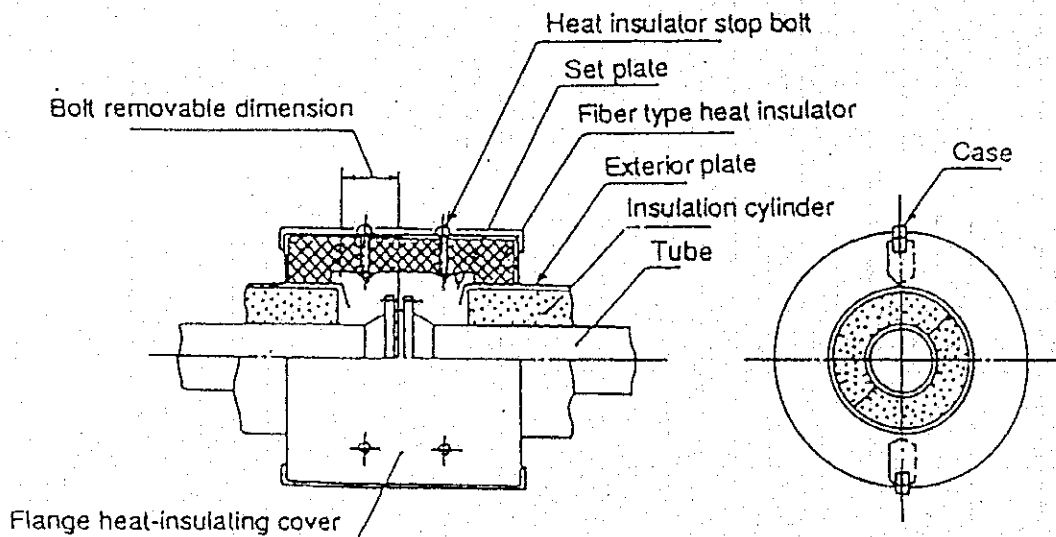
Standard Drawing of Thermal Insulation for Valves and Flanges
